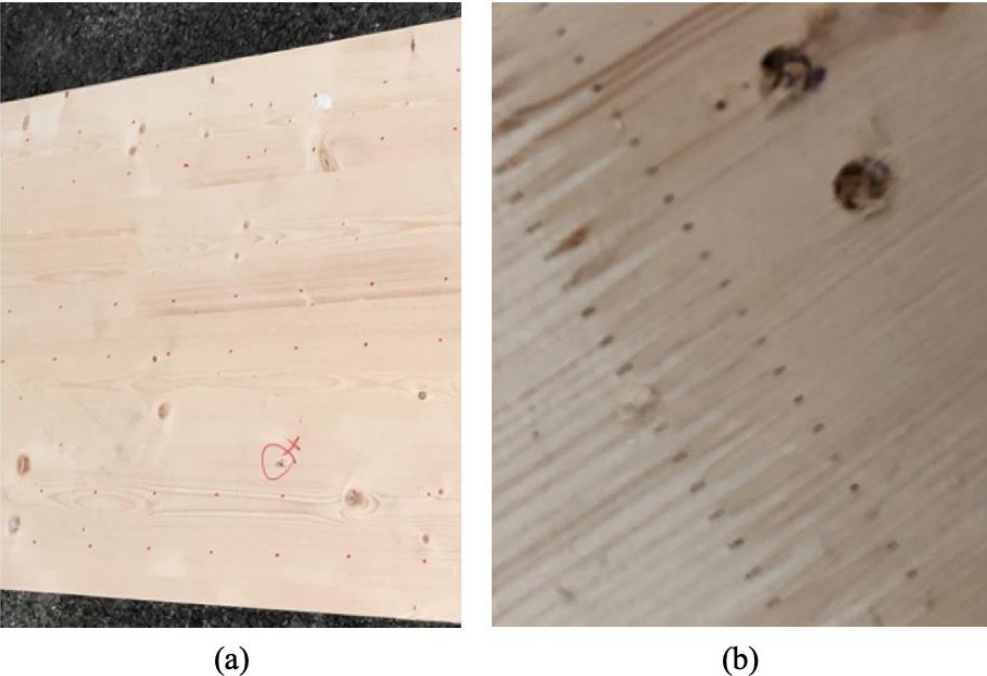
(a) shows the hole through whole the CLT slab (b) shows the wrongly predrilled hole near a finger joint
